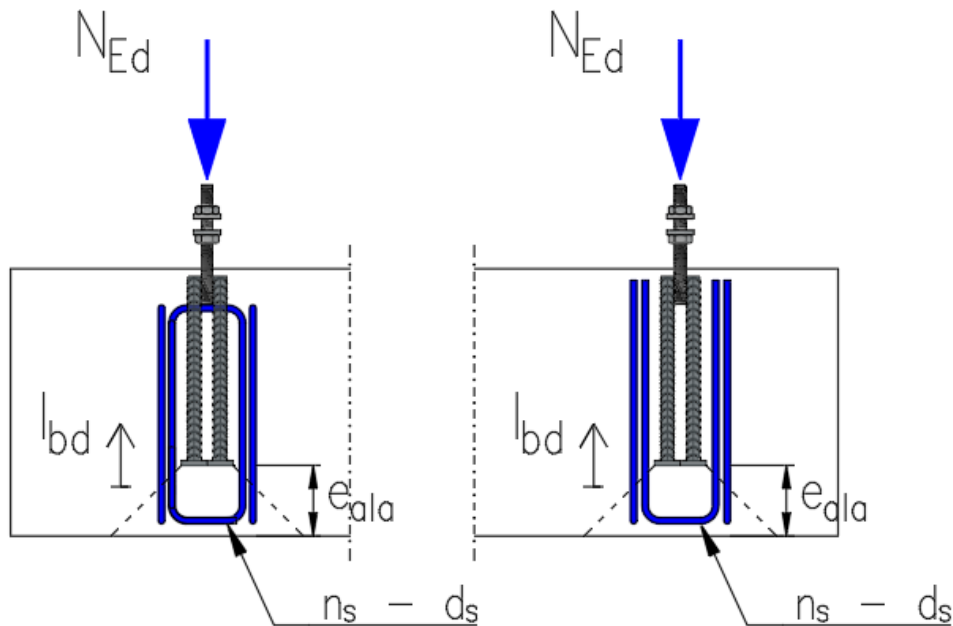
Reinforcement and distance from bottom for compressed SELP/L bolts
